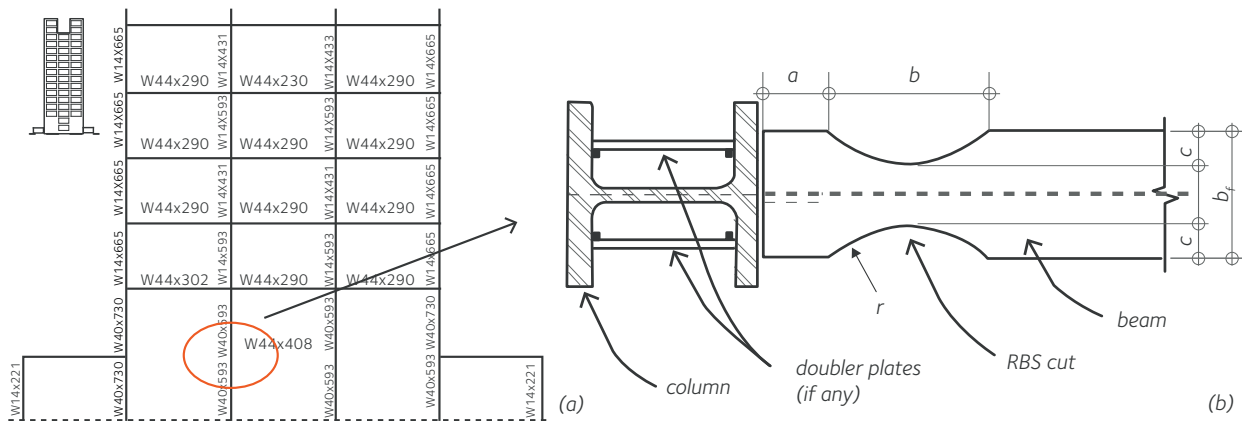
a) Sections at the lower storeys of the Case study building, b) Plan detail of the examined beam-column connections with doubler plates.
